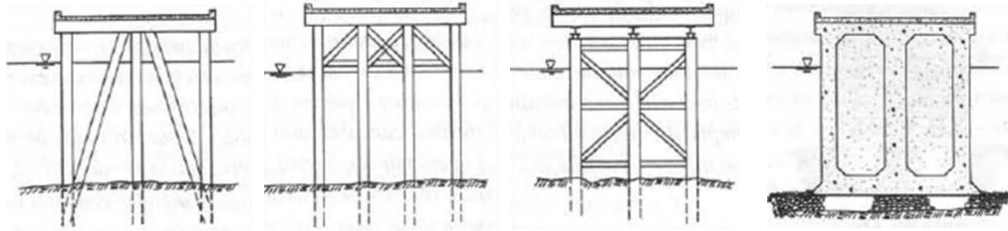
Different types of piers. From the left: batter pile, braced, jacket, concrete caisson (Gaythwaite John, 2004)
